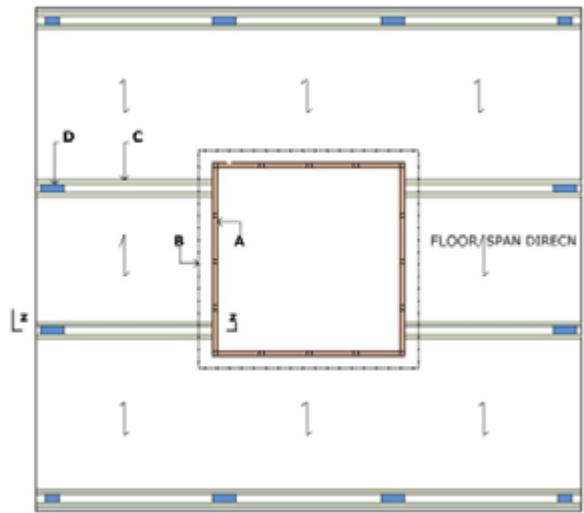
Plan of structure, A - integrated panel core, B - 'hoop' beam at each floor level, C - engineered timber floor beam, D - engineered timber column
